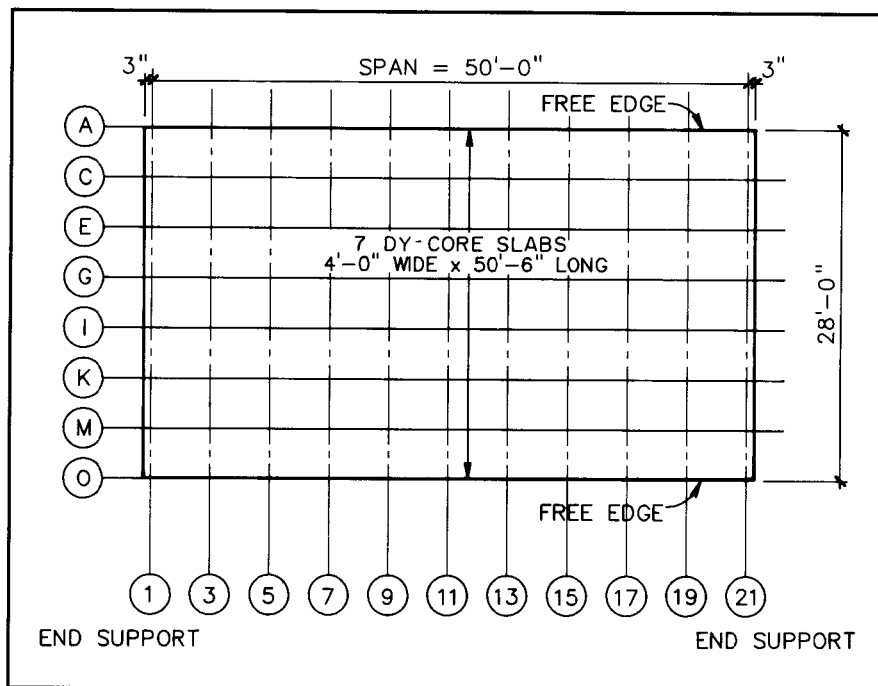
Plan view of hollow-core slab test deck (see Ref. 13).
